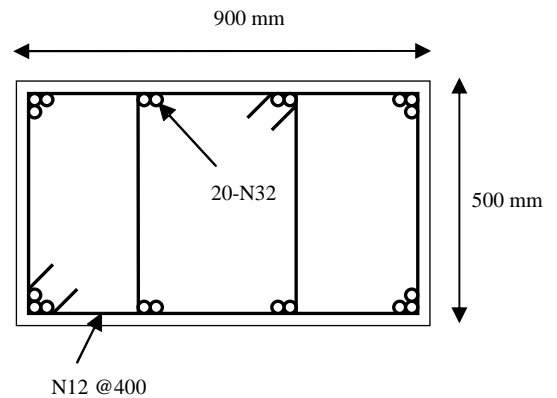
Cross section of the NSC column – Ordinary detailing (400 mm ligature spacing).
